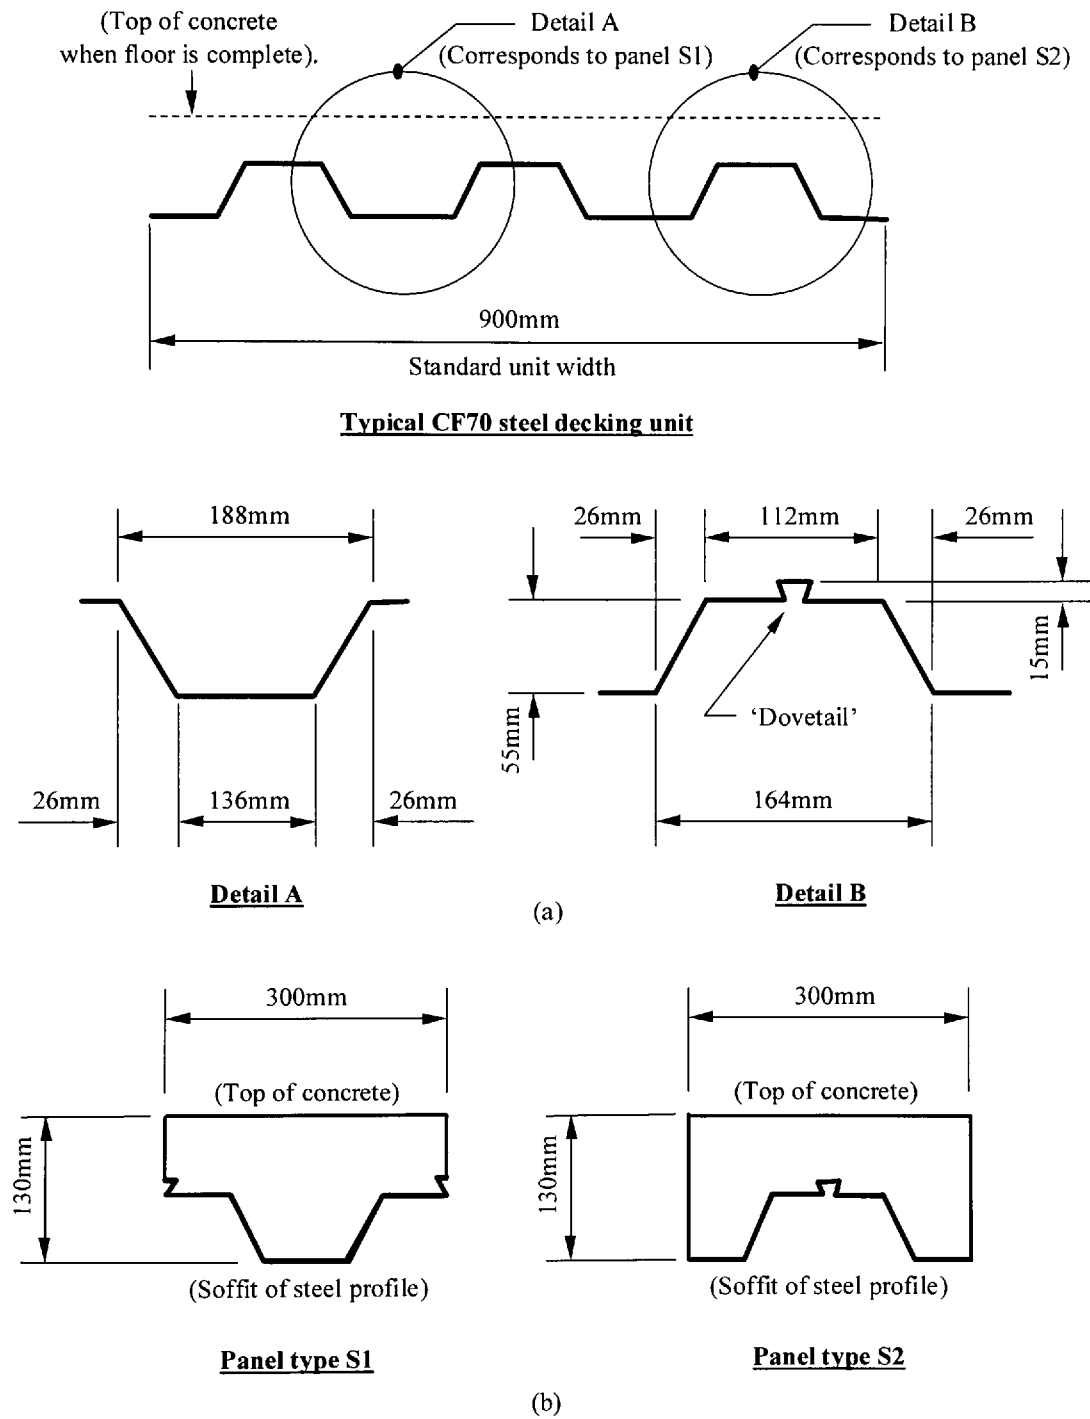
Detail of (a) a typical single CF70 steel deck unit, and (b) a cross-section through the laboratory test panels
